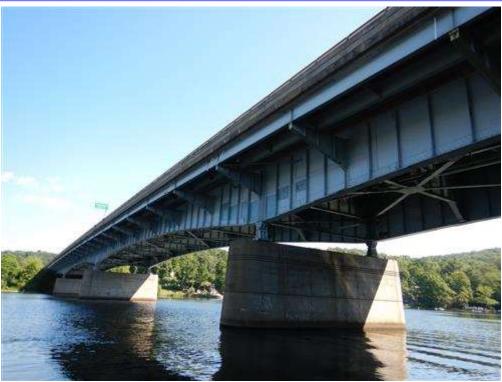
Photo Taken: 07/18/2018 Upstream (North) Bridge Elevation
